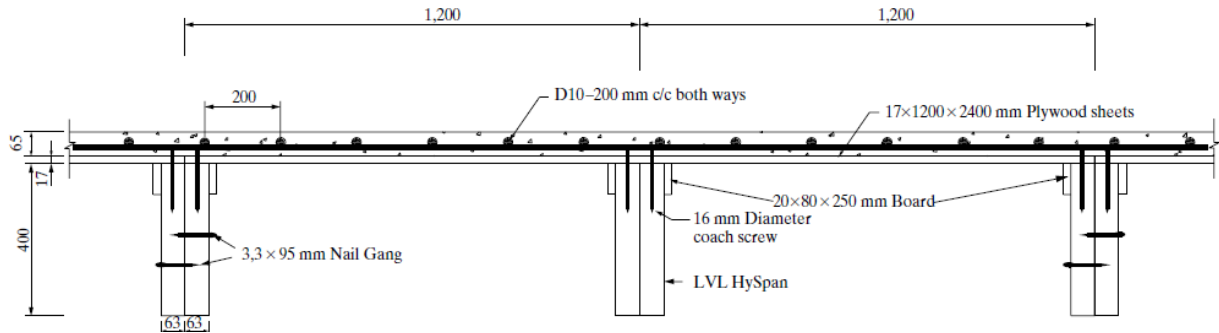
Cross section of L.V.L composite floor system in new zealand (Buchanan A et. al.2008)
